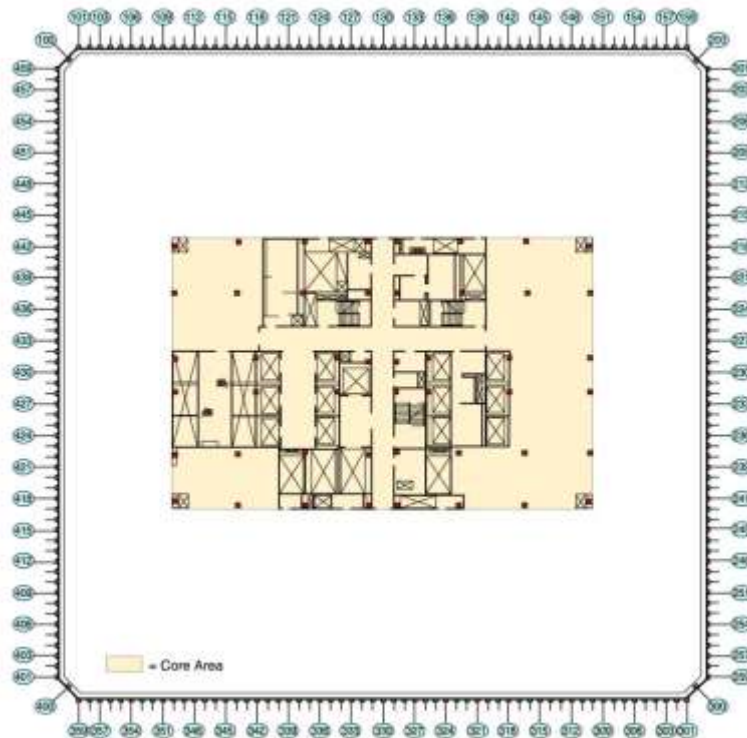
Representative floor plan (based on floor plan for 94th and 95th floors of WTC 1).
